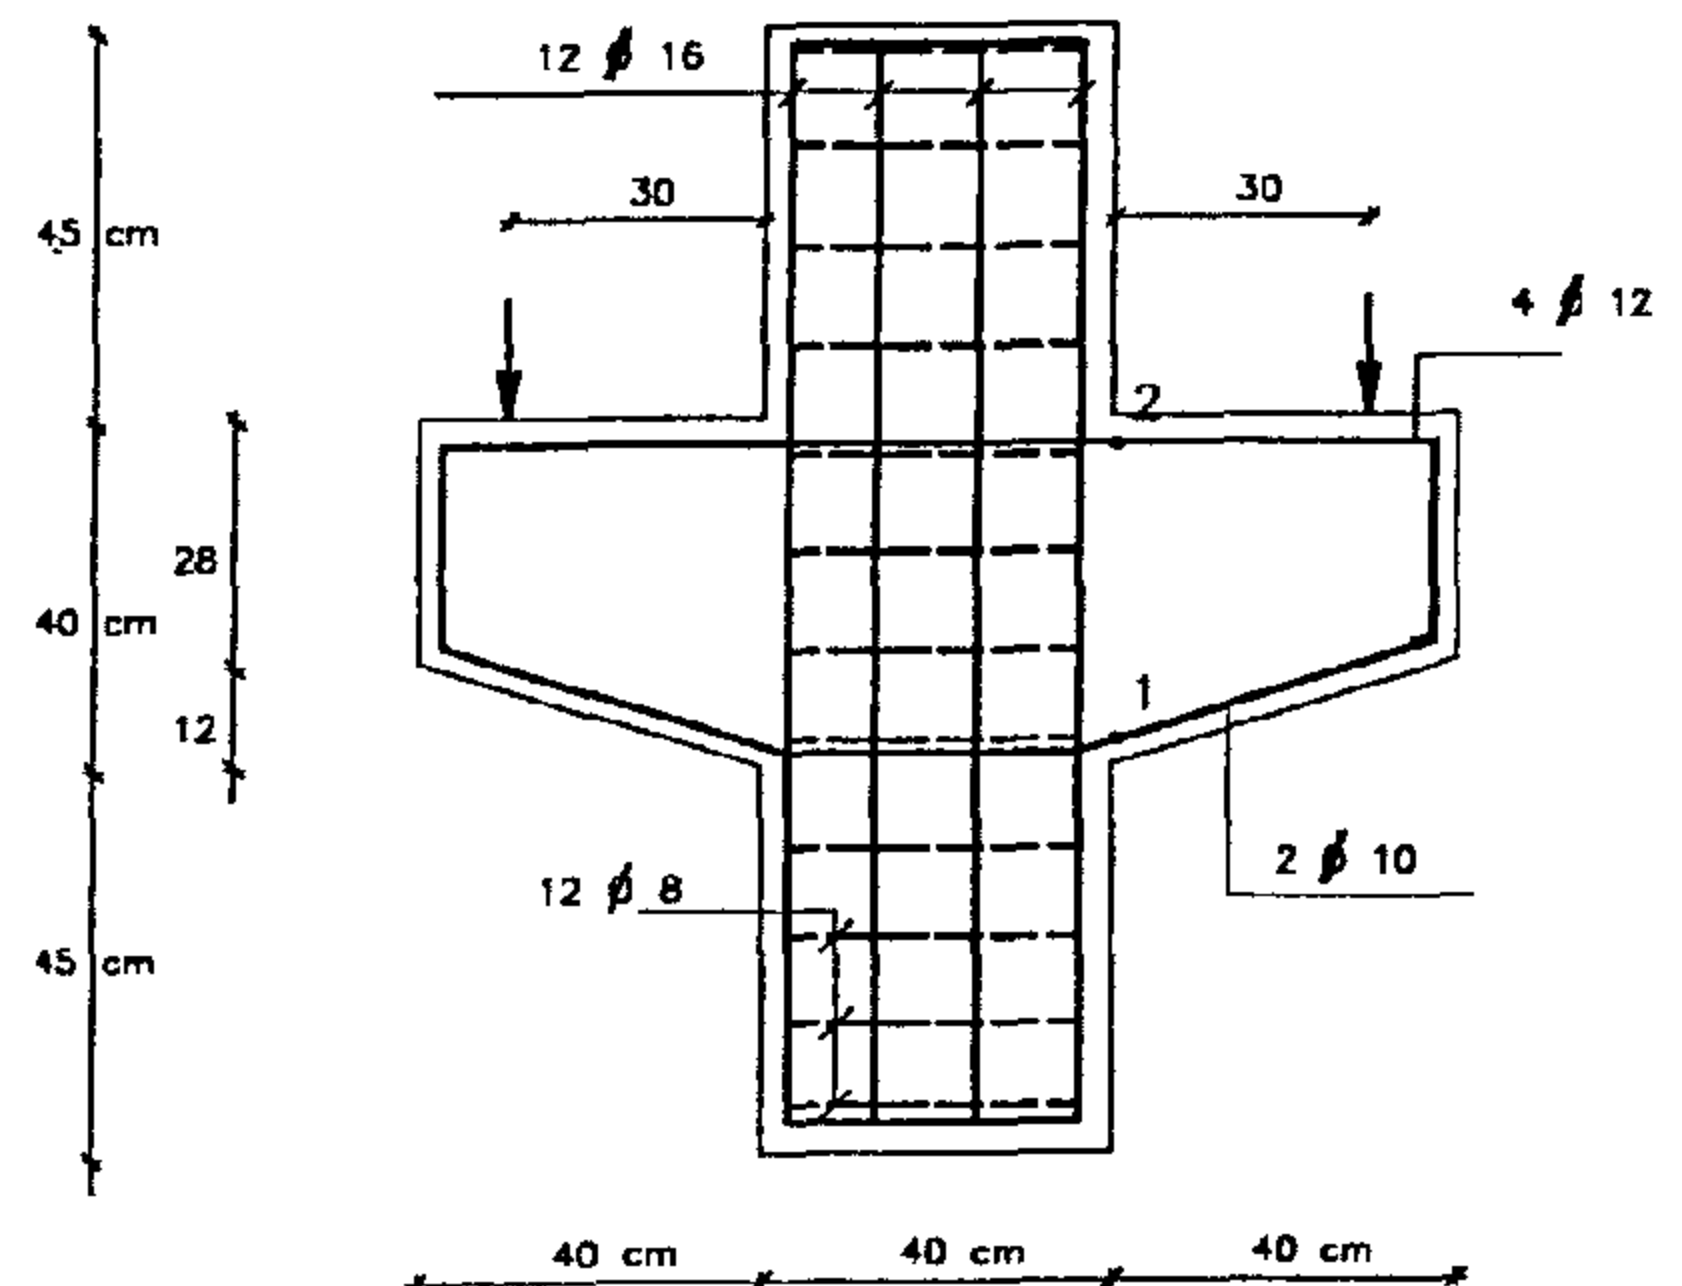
Dimensions, reinforcement arrangements and positions of electrical strain gauges for corbel T5
